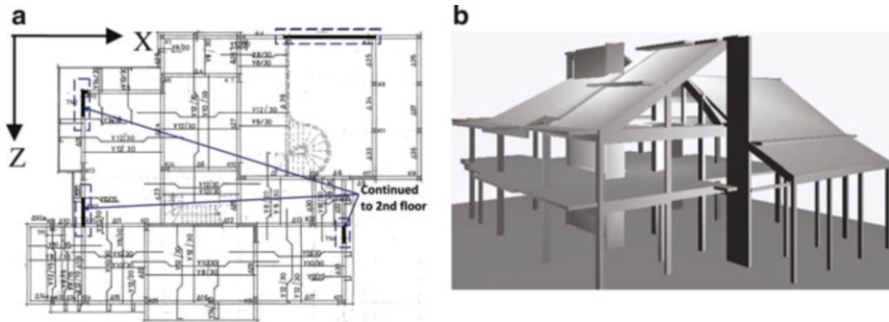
Two-storey building: (a) ground storey plan with the four walls added at the only possible locations on the perimeter; (b) axonometric, as-built
